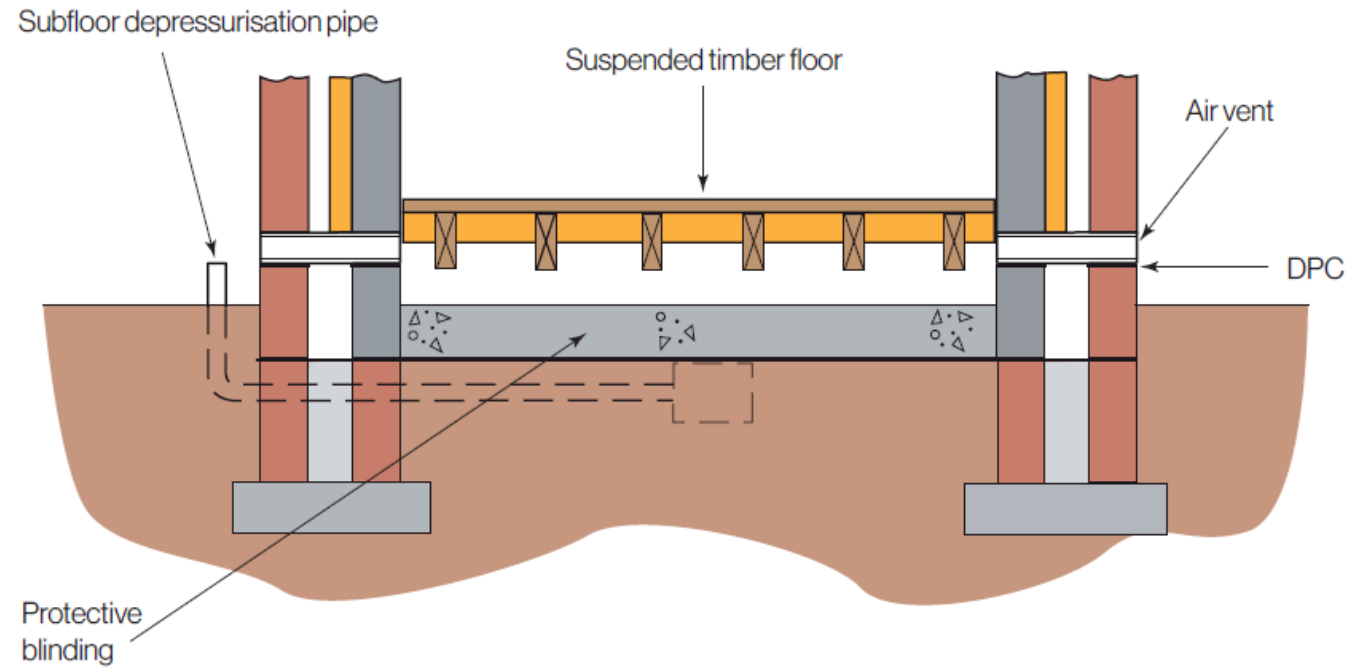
Full radon protection to a suspended timber floor with the barrier laid under the blinding and extended out through the walls
